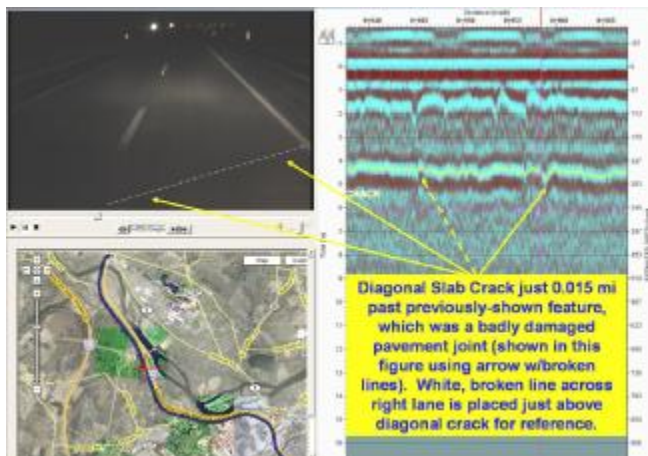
Severe Crack in Pavement Slab Near Joint shown on the Surface (Video) and Subsurface (GPR)
